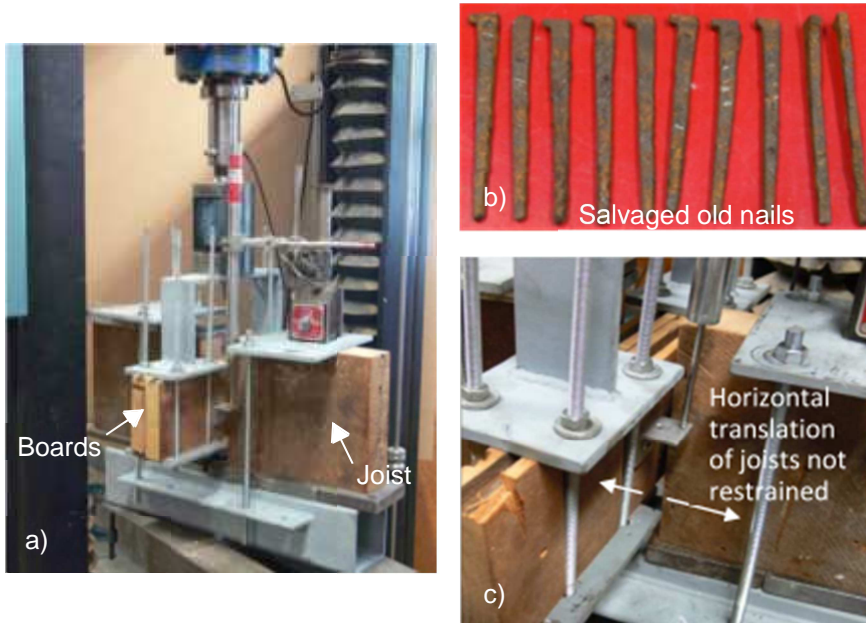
Board-Joist connection preliminary testing campaign: details
